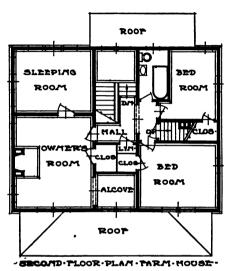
Second-floor plan of house shown in Fig. 221.
